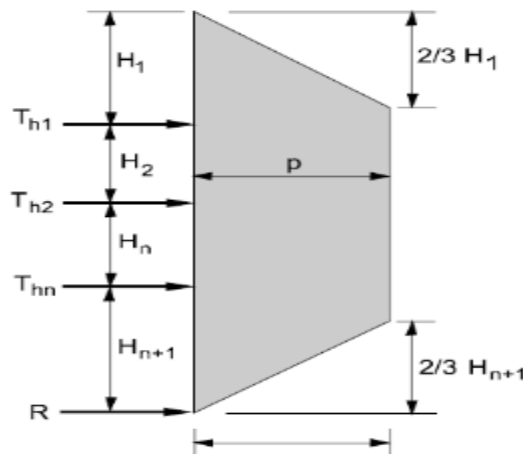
Anchor Loads for Multi - Level anchored Wall (Aiza Malik 2015)
